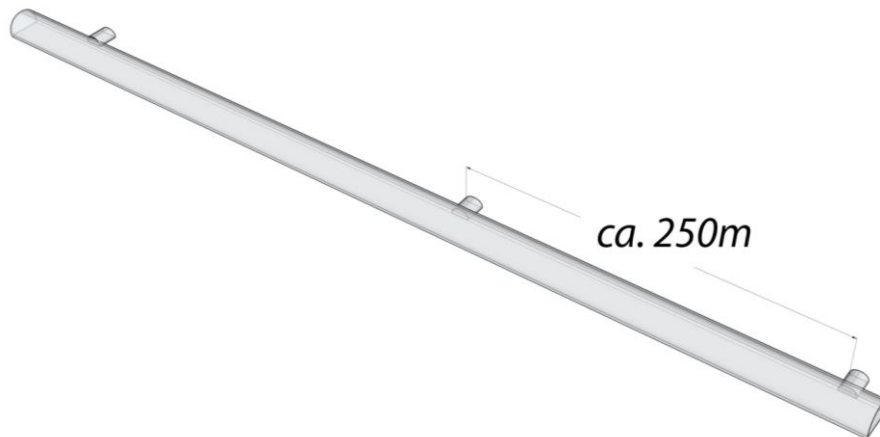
Illustration of main tunnel with small tunnel stubs or niches for placement of evacuation shelters.
